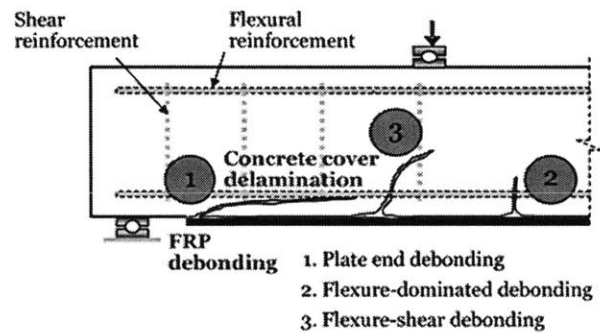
Typical failure modes of FRP-retrofitted reinforced concrete beam (Büyüköztürk et al. 2004)
